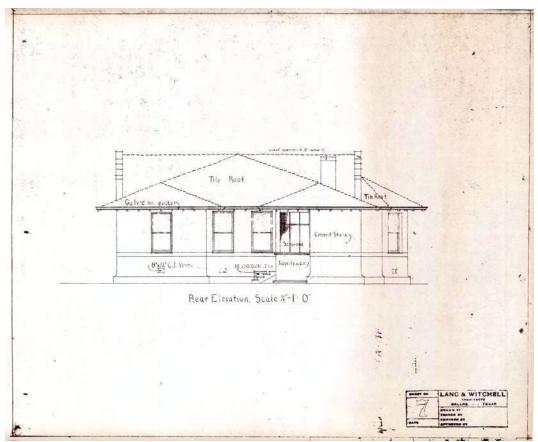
Original Lang and Witchell Rear (Northwest) Elevation - Sheet 7
